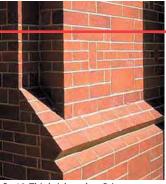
This brickwork at Princeton was designed to articulate the building components by casting shadows.
